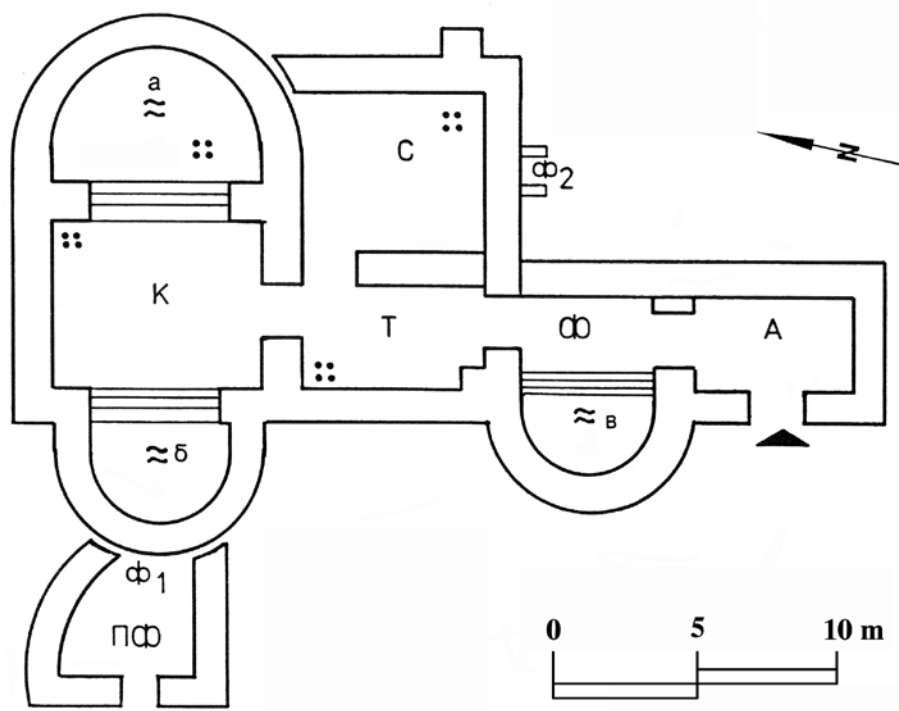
Plan of bath from the 4th century in the excavations for flats Mladost 1-2 Second building period.
